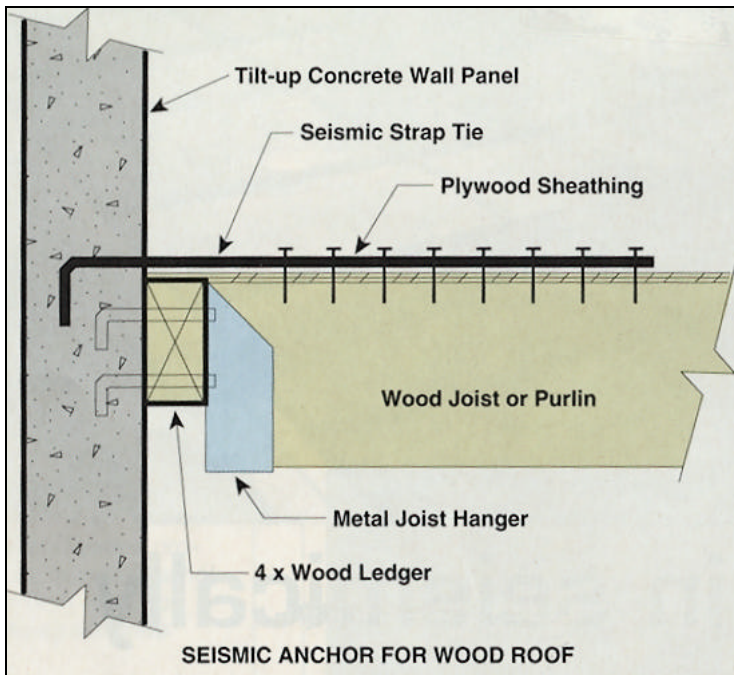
Floor and roof framing is directly anchored to the wall panels independent of the ledger.
